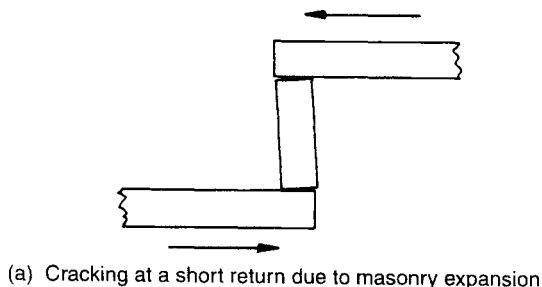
Cracking at a short return in brick masonry.
